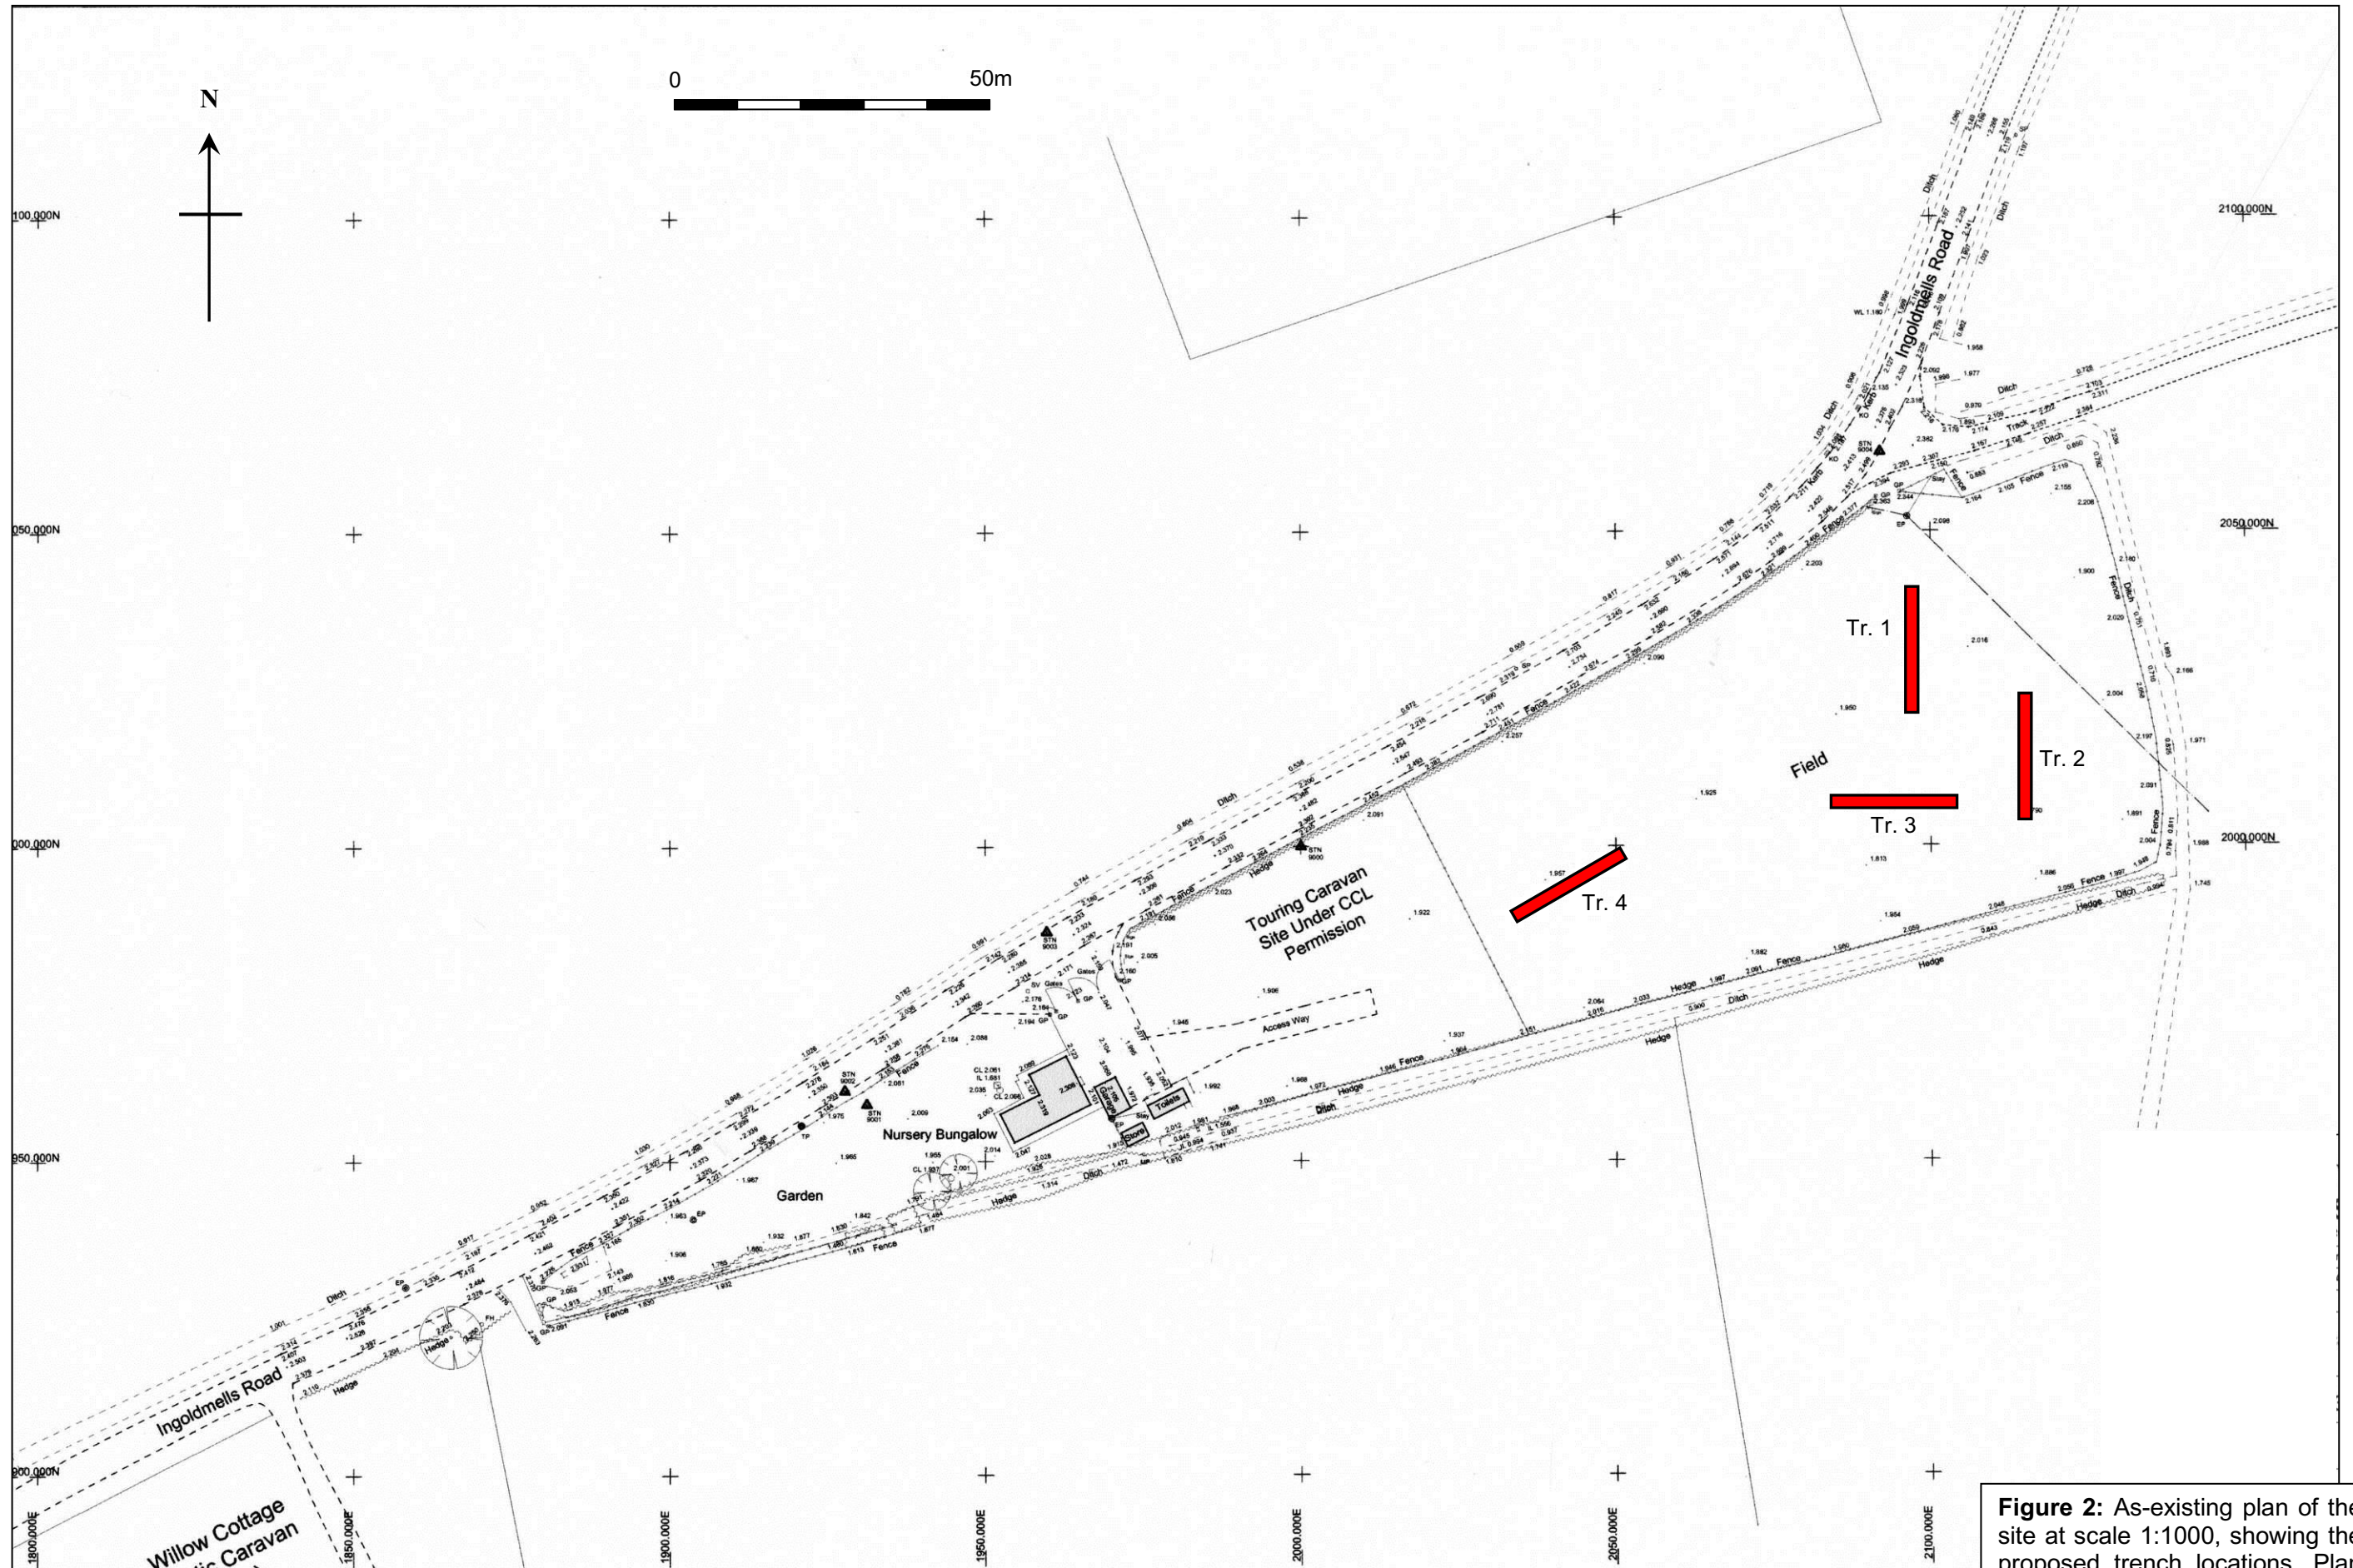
As-existing plan of the site at scale 1:1000, showing the proposed trench locations. Plan supplied by client.
